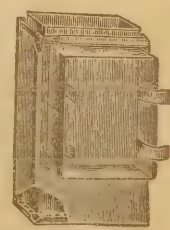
THROUGH STACK HEAD used for first floor wall register where stack is continued up to second floor.
